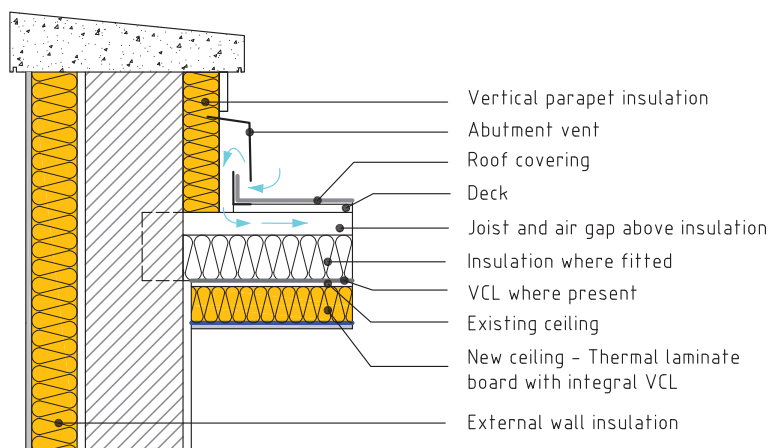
Cold deck and parapet insulated with EWI and top-up thermal laminate board added underneath
